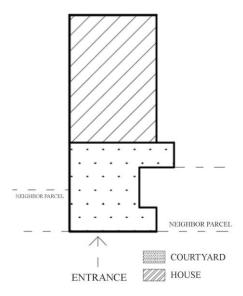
Plan of a house with an entrance through a courtyard (C Plan Type) (S.Sevimbige archive, 2018
